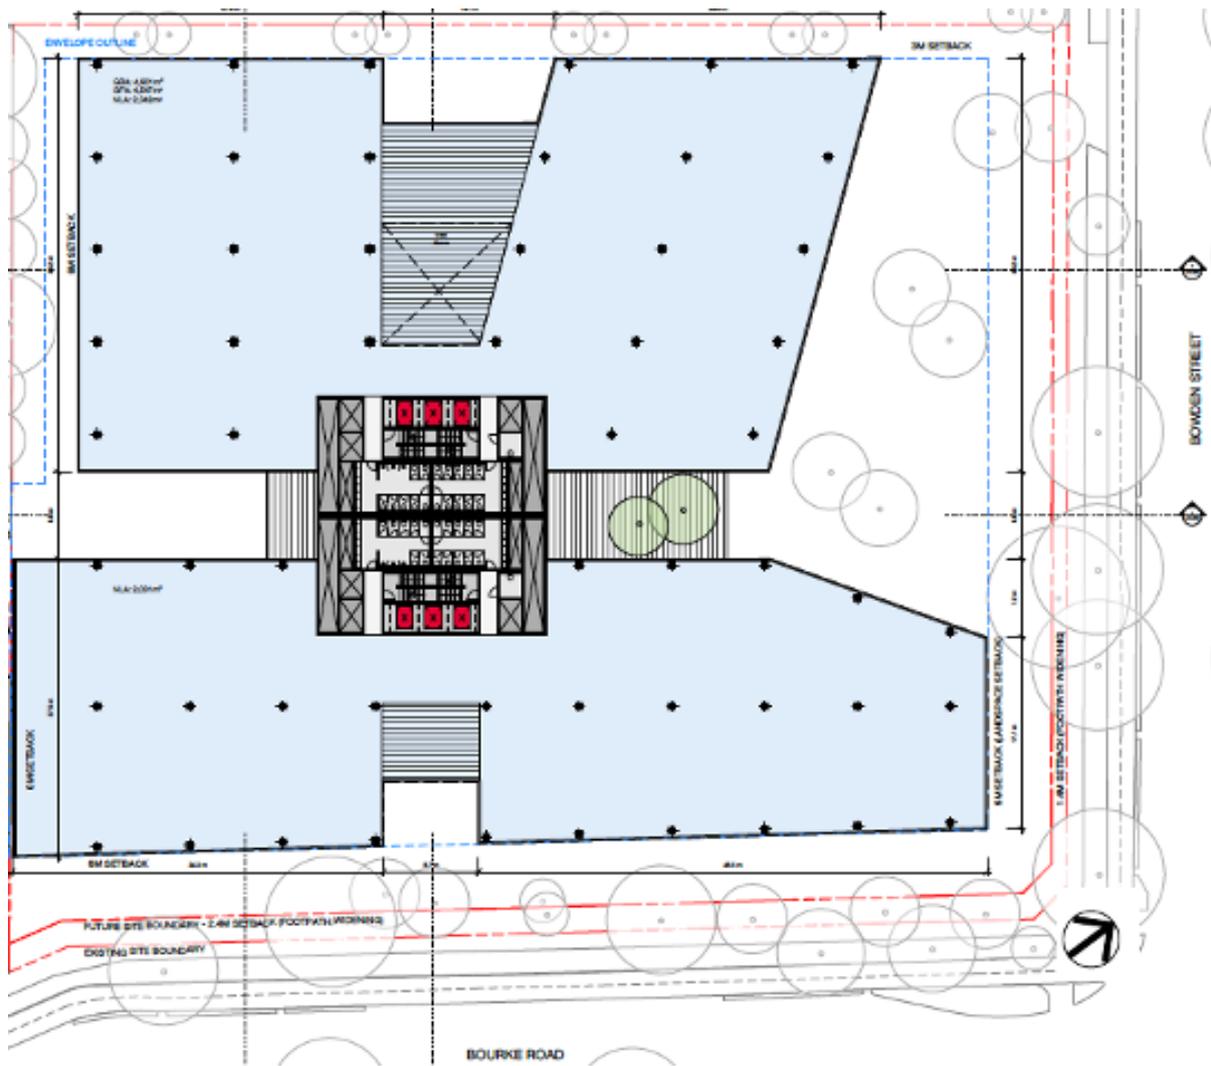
Proposed indicative concept design Level 1 plan (level 2 and 3 similar)
